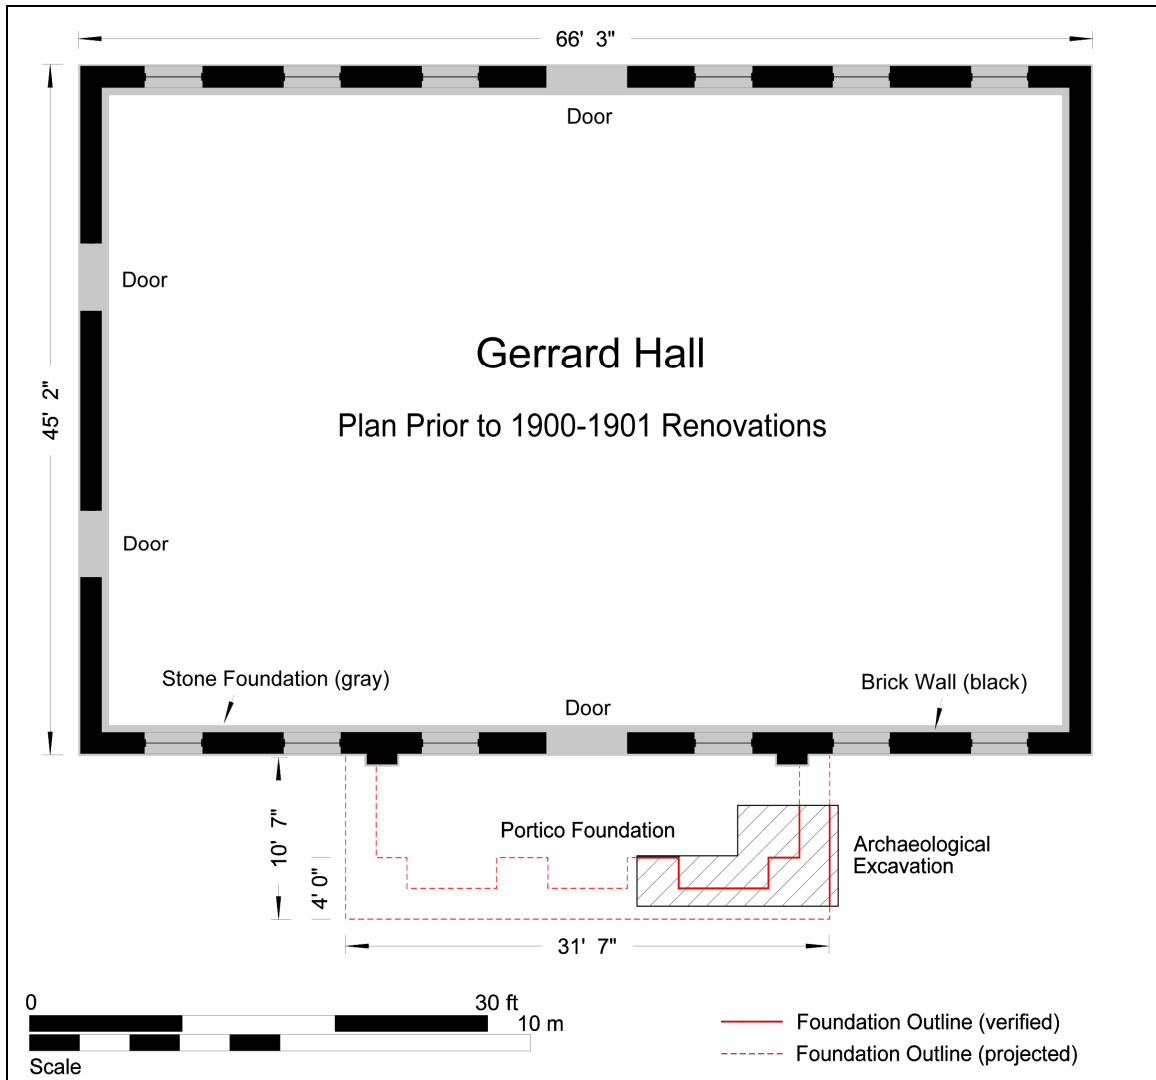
Plan of Gerrard Hall prior to the 1900–1901 renovations which removed the south portico, closed the north and south doorways, and created doorways on the east and west ends. The portico foundation, as revealed by archaeological excavation, is outlined in solid red. The dashed red line indicates the projected limits of the remaining foundation. North is to the top of drawing.
